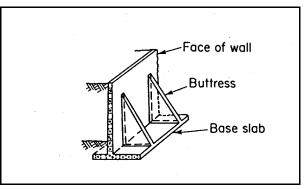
Butressed Retaining Wall (Source: Teng Foundation Design)
